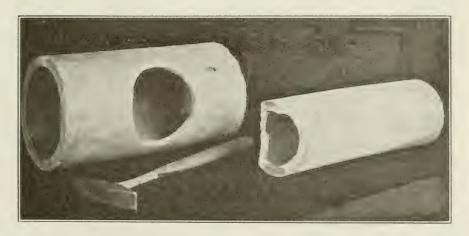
Five inch tile shown in Fig. 26 with opening enlarged to receive three inch file. The three inch file is shown with end shaped to set in the opening in the larger tile. The larger har mer used is also shown.
